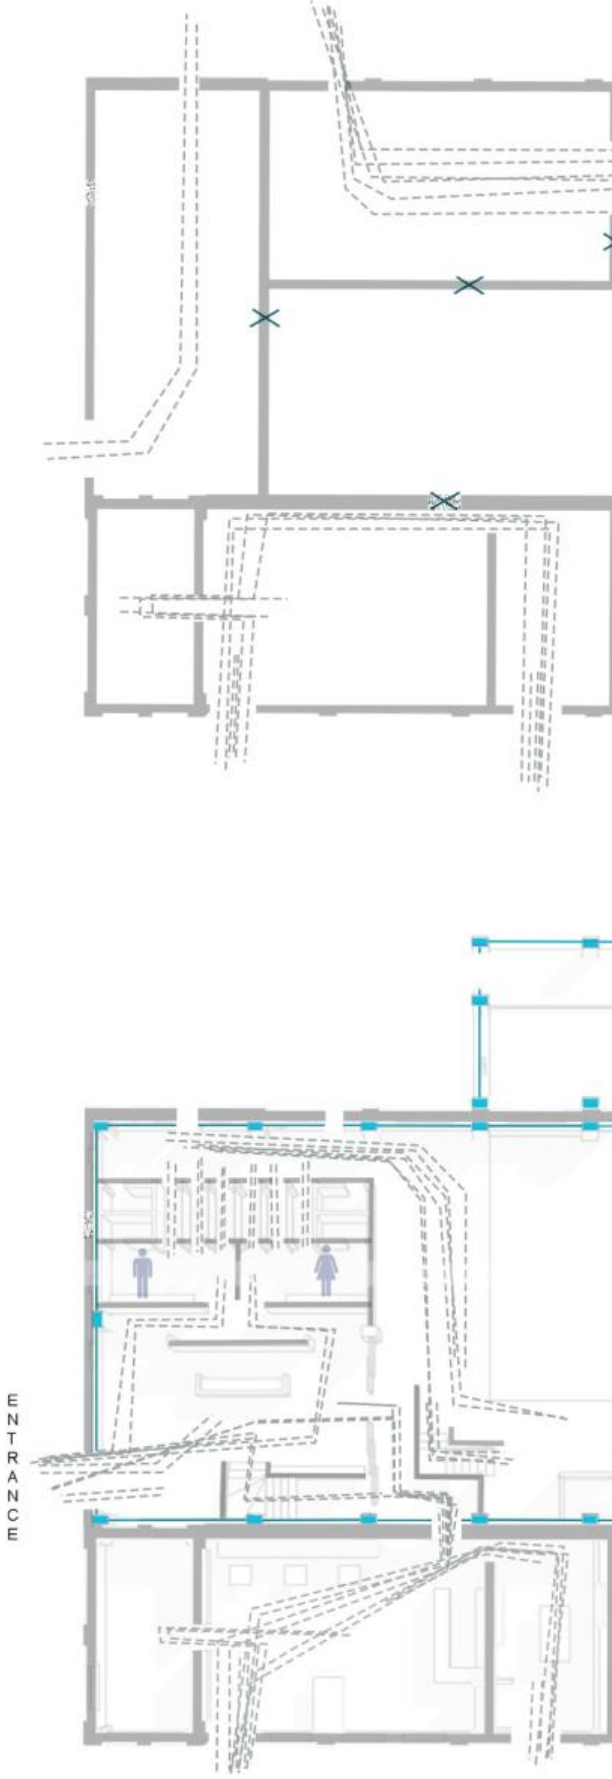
SPATIAL PLANNING AND CIRCULATION DIAGRAMS - FLOOR PLANS 1:300
